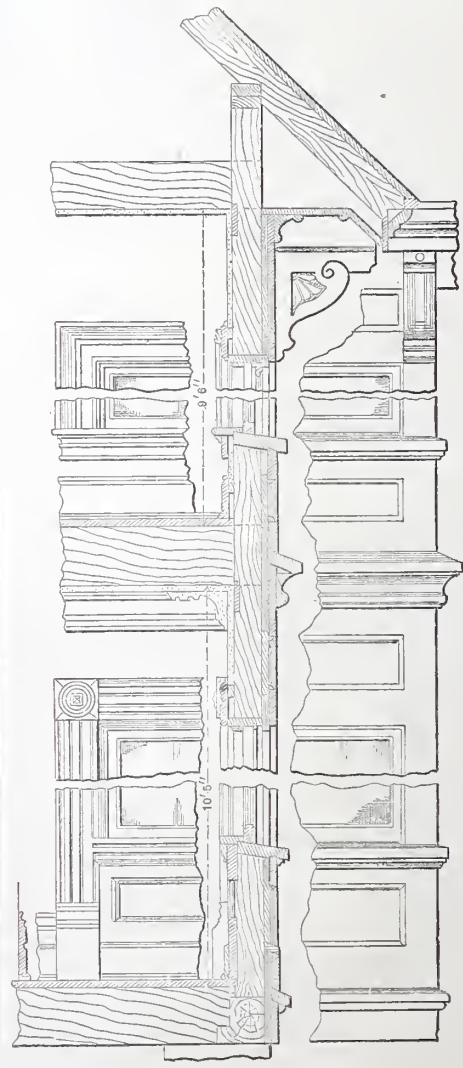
Combined Elevation and Section Showing Interior and Exterior Finish.—Scale, $\frac{3}{8}$ Inch to the Foot.
